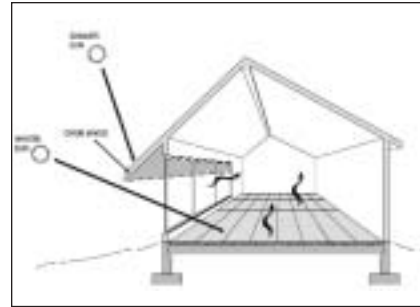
Overhangs above south-facing windows shade the summer sun and let in the winter sun.
